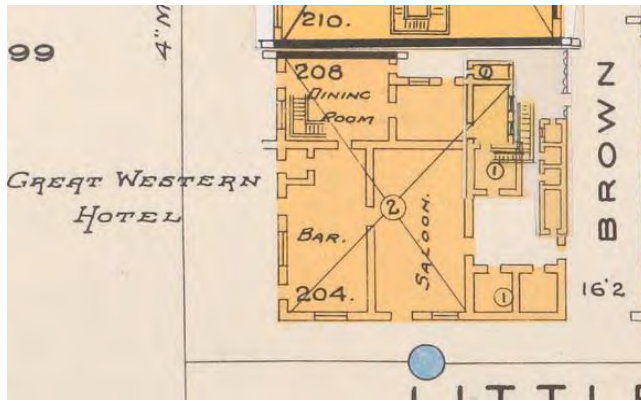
Extract from fire survey plan showing internal layout and reconfiguration. (Source: Mahlstedt Map section 1 no 19, 1948)
